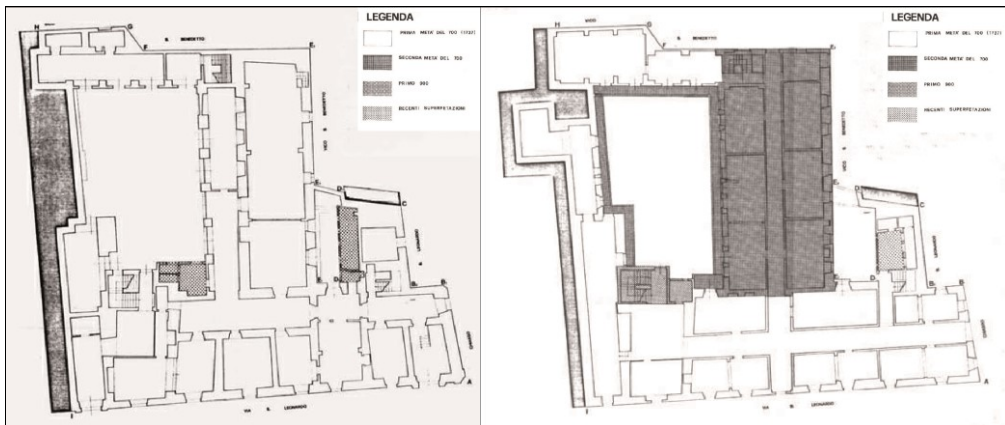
Plan of ground and first floors, with successive modifications (in grey)
